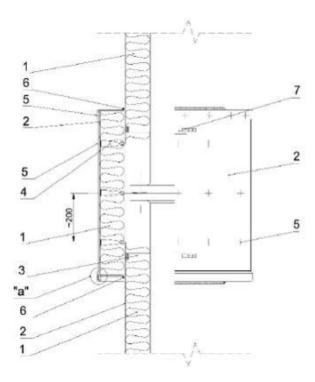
Insulation of flanged joints on vertical pipelines. 1 - Insulation mat, 2 - Insulation jacketing, 3 - Supporting structure, 4 - Insulation fixing element, 5 - Tube rivet with fixing core, 6 - Sealing with silicone putty, 7 - Cap lock.
